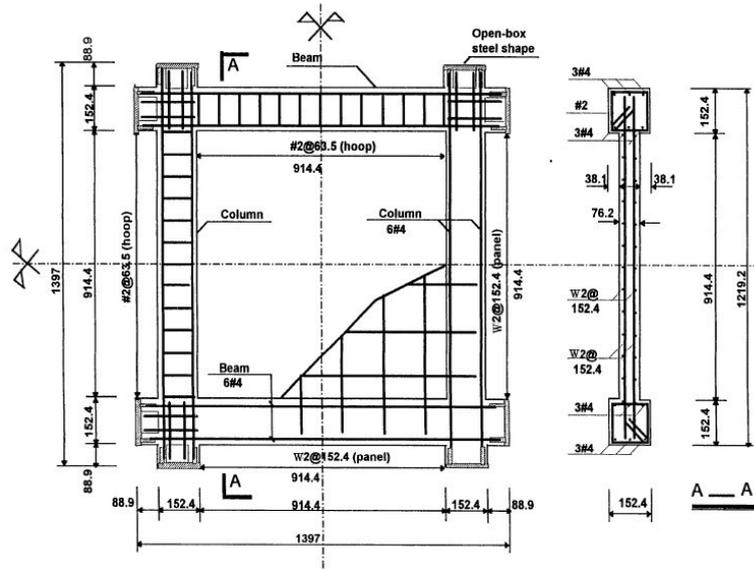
Dimensions and steel arrangement of specimen FSW-13 (Gao 1999)
